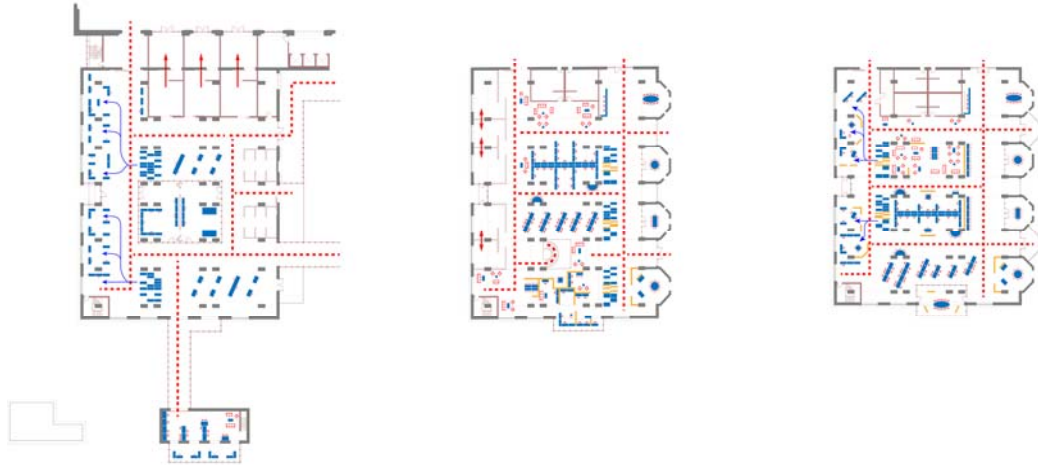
Flexible Floor Plans and Furniture Layouts (source: author)
